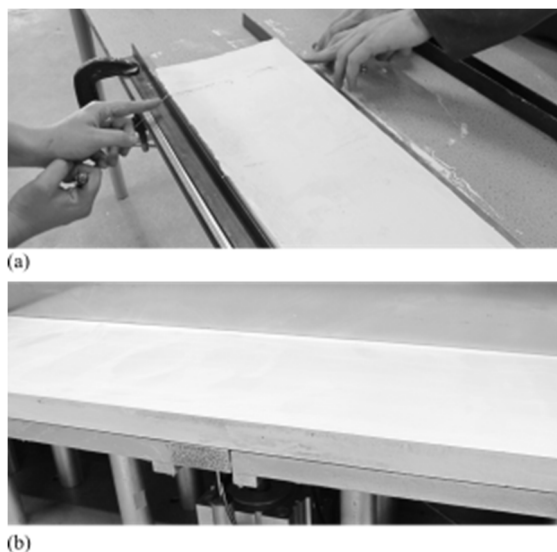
Preparation of the clay liner (a) Trimming to thickness of 25 mm using steel guides and wire once clay has been removed from
